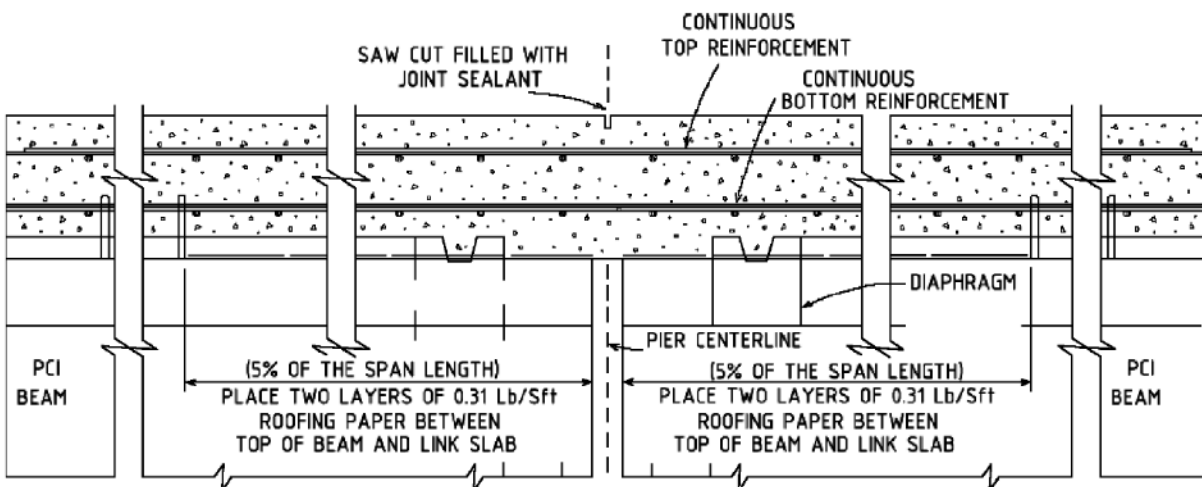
Proposed link-slab details (Ulku et al., 2009)
